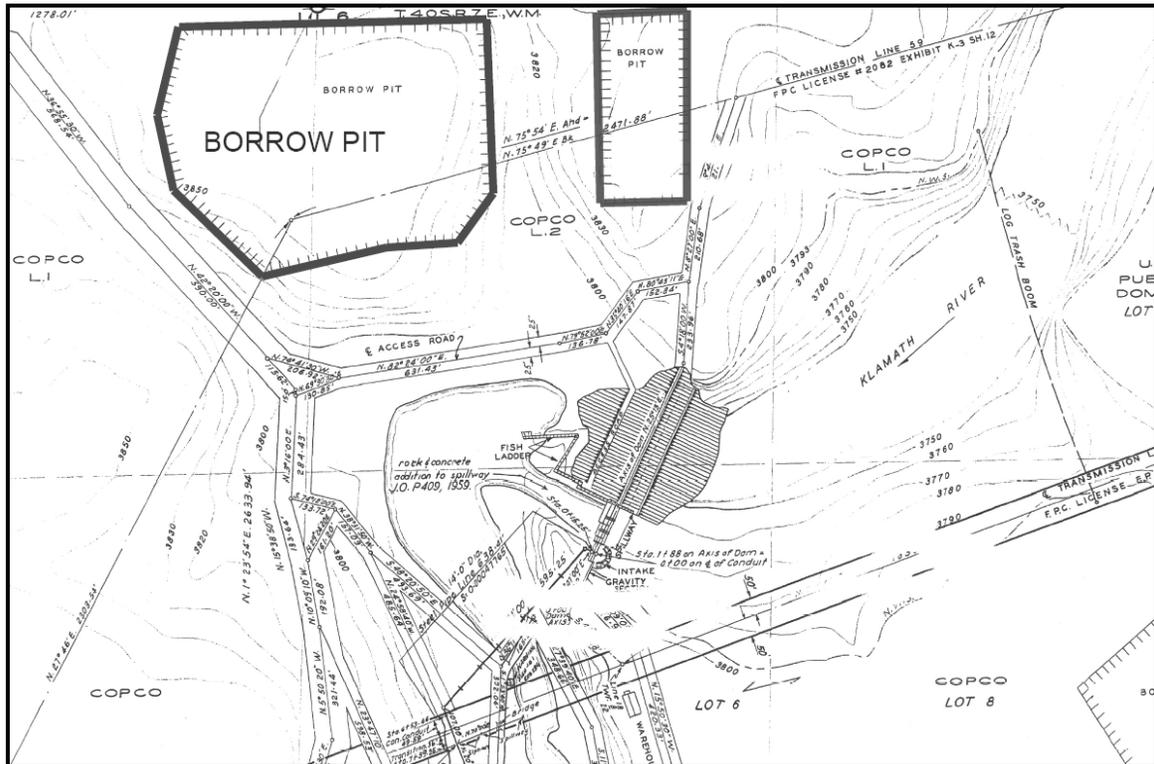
Plan of J.C. Boyle Dam and Borrow Pit
